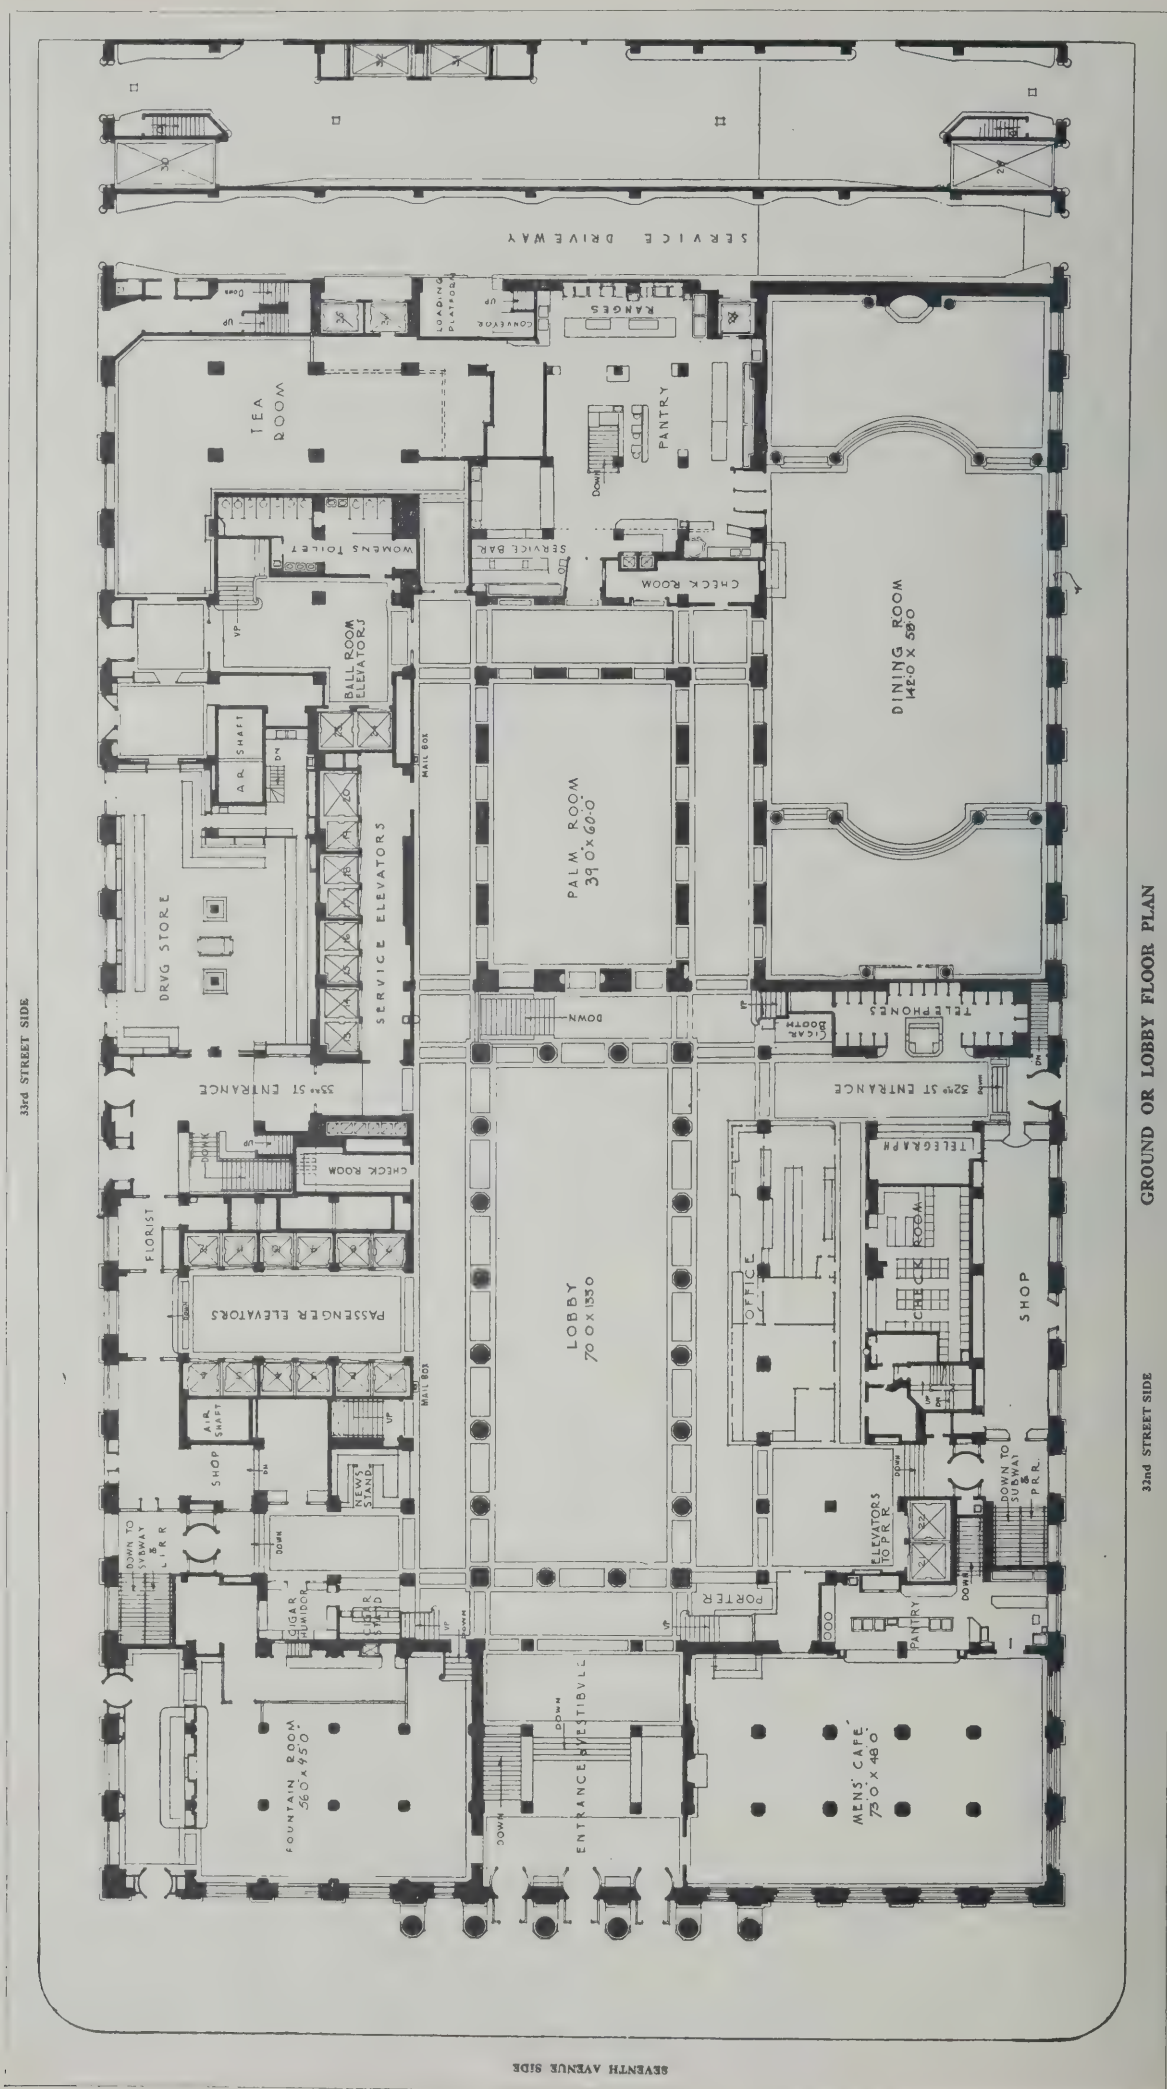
THE PENNSYLVANIA HOTEL, NEW YORK: GROUND-FLOOR PLAN. MESSRS. McKIM, MEAD & WHITE, Architects.
